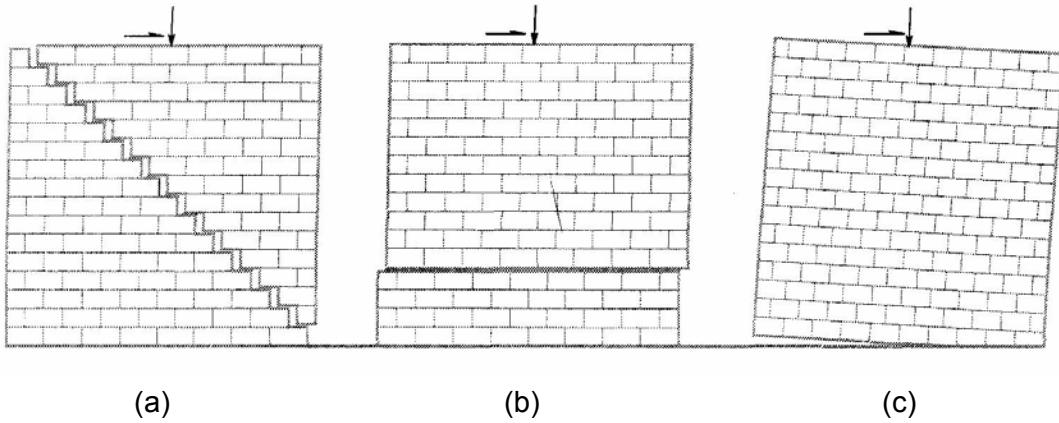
Typical failure mechanisms of unreinforced masonry subjected to in-plane shear: (a) diagonal cracking, (b) shear sliding, (c) rocking.
